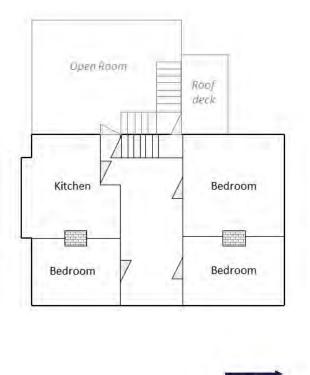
JS Wells House, second floor plan view. Note that greyed features represent the 1960s addition.
